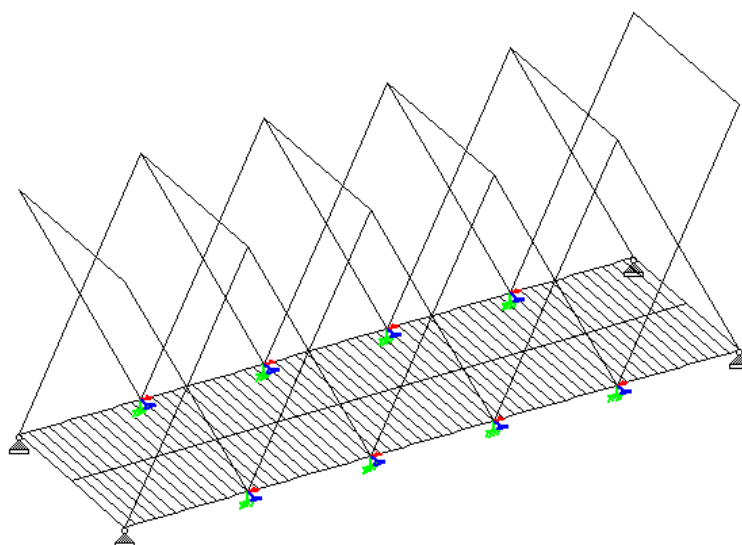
Plan view of Pedestrian bridge made up of Bamboo with single stiffener -Case 2 (BC2)
